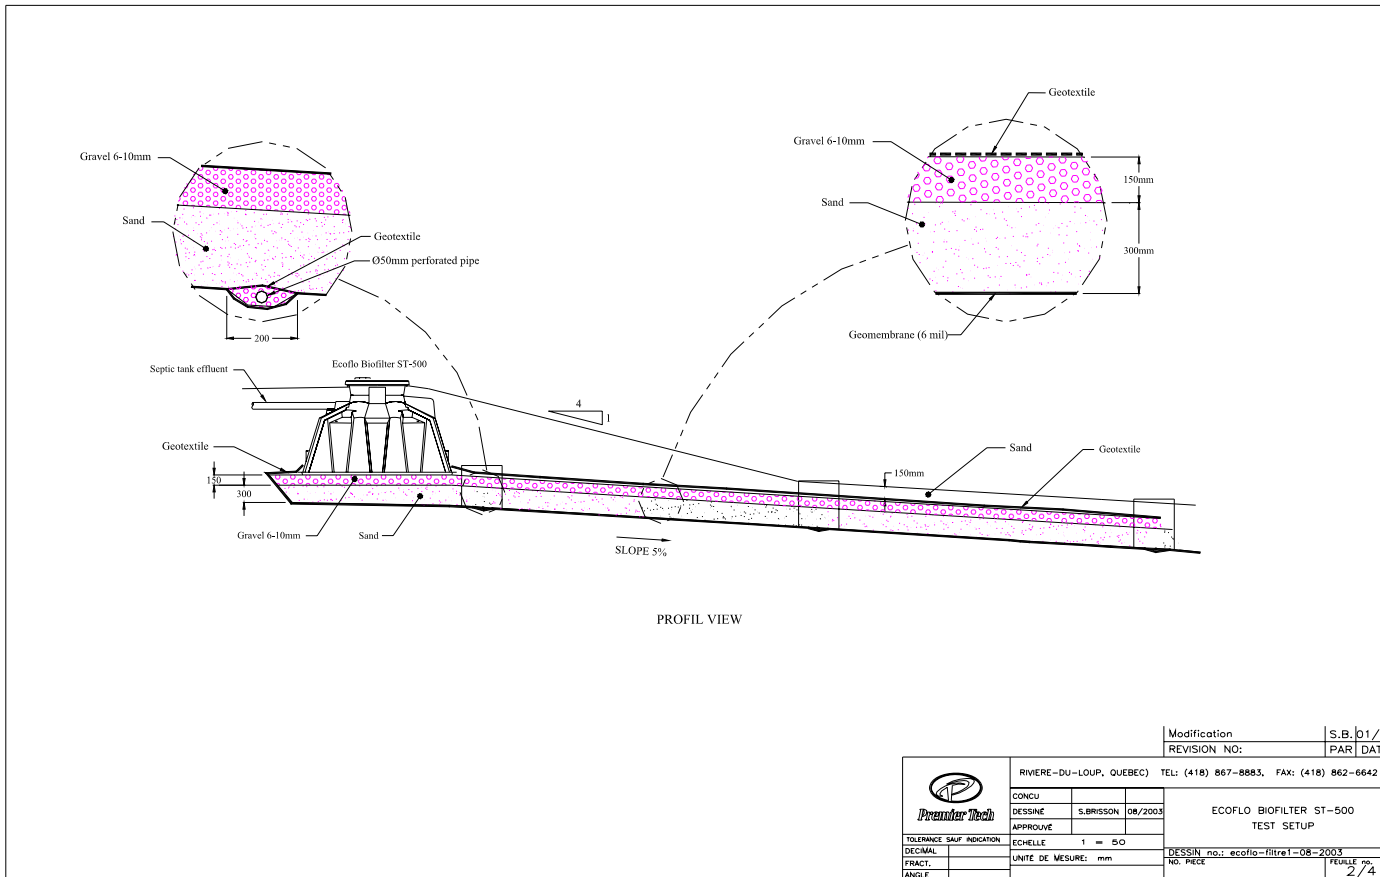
Profile View of the Horizontal Sand Filter tested at ORWC (Site 1)
